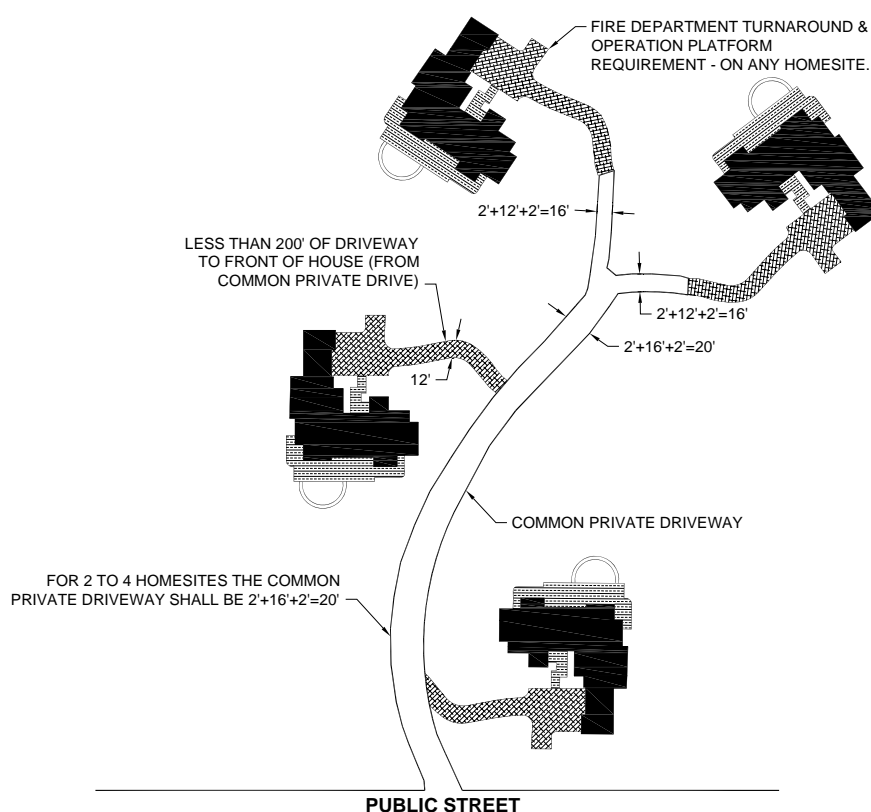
PRIVATE DRIVEWAY DESIGN FOR EMERGENCY ACCESS
